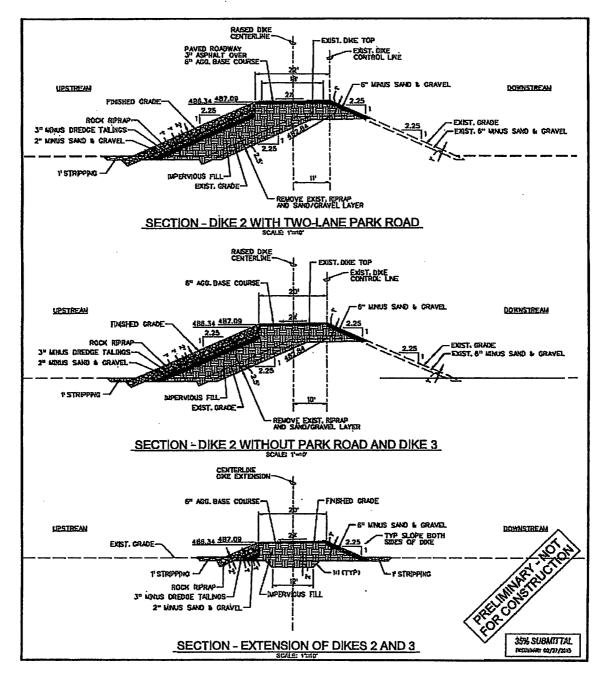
Preliminary typical cross sections for 3.5-foot raise at Dike 2 and Dike 3.
